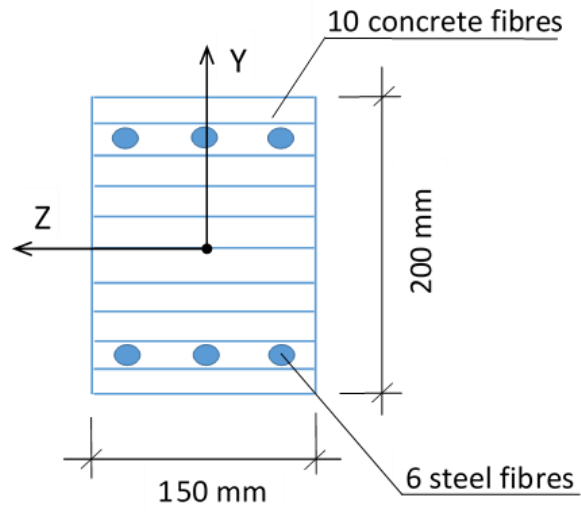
Fibre beam element cross section mesh for specimen H60-10.5-C0-2-30
